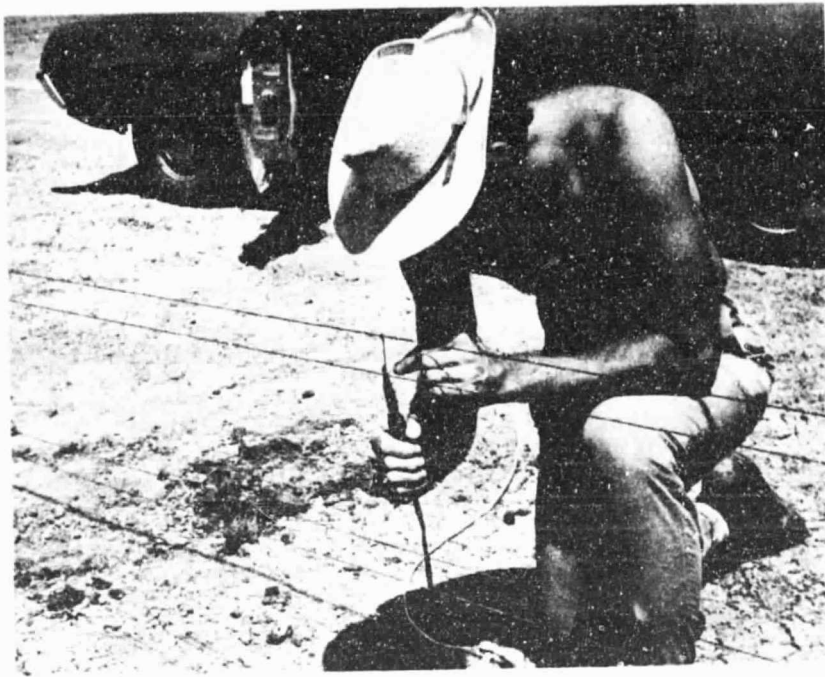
Resistance soldering unit used for much of the field soldering on the transmission lines. The unit is a commercially available device which was operated off 12 volt vehicular power. "95/5" tin/silver solder was used throughout the array because of its far superior weathering resistance compared with ordinary tin/lead solder. Stan Shawhan is shown installing a short on one of the east-west open wire transmission lines.
